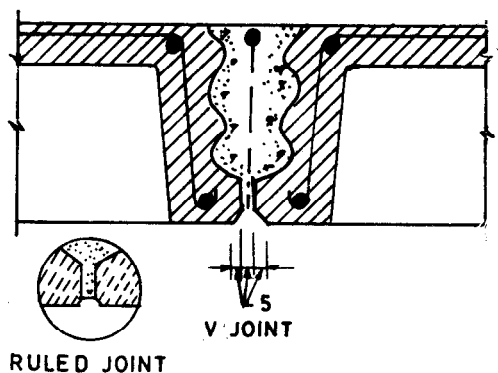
DETAILS OF 'V' JOINT AND RULED JOINT
